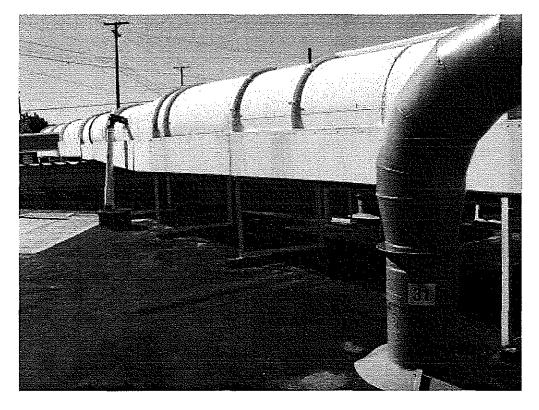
(Photo 3): Scrubber #3 ductwork, looking SE.
